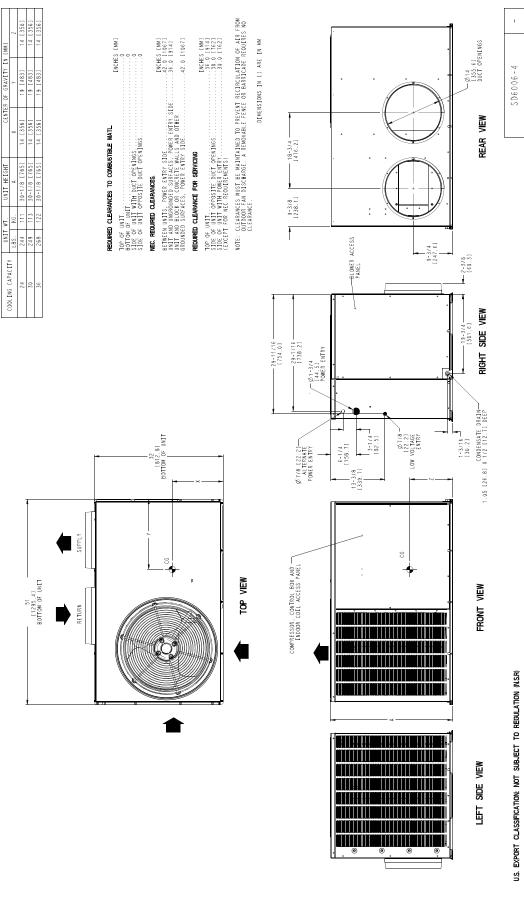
Unit Base Dimensions, PA5Z024-036
